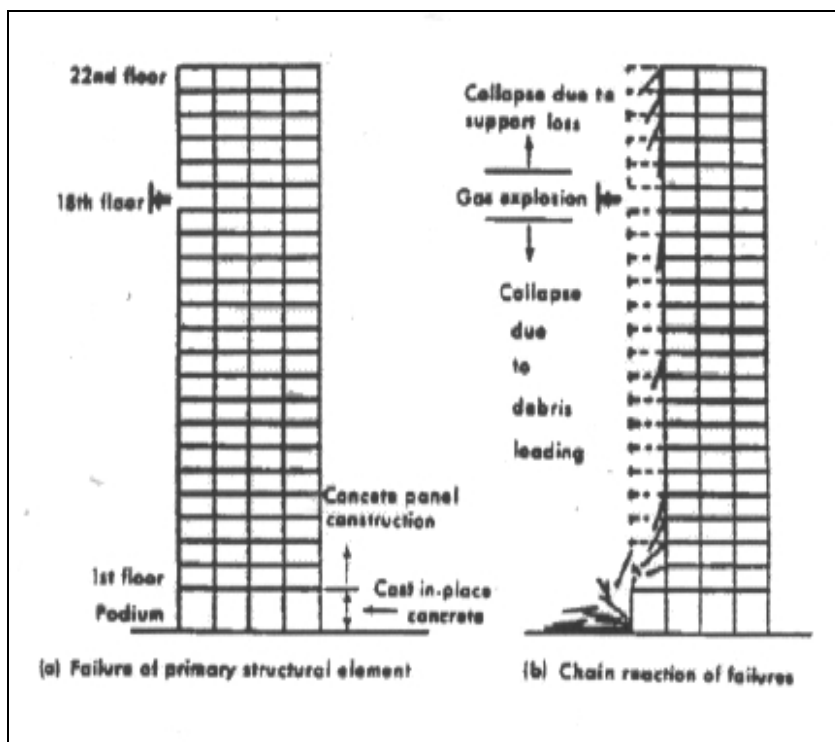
Schematic of Ronan Point Building collapse [4]
